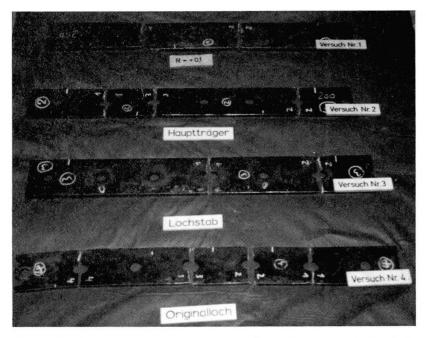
Specimen after failure (punched specimen from Stahringen bridge)
